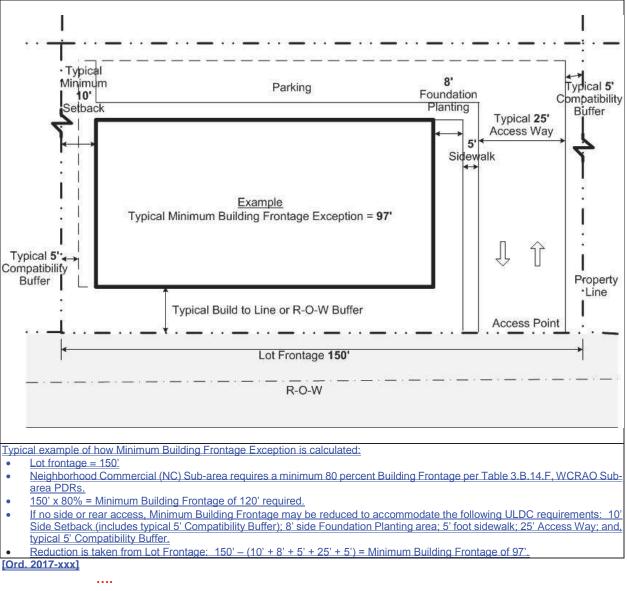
B.14.F – Typical Example of Minimum Building Frontage Exception
